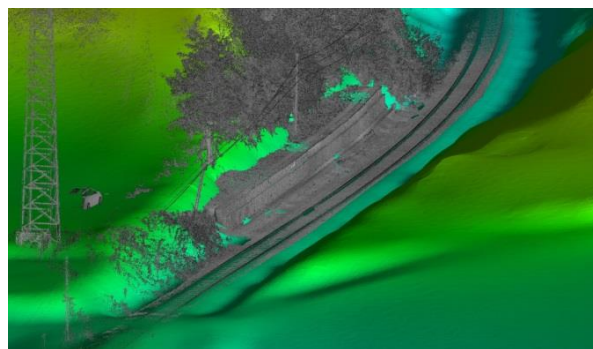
SITUATION WITH THE RETAINING WALL STRUCTURE
